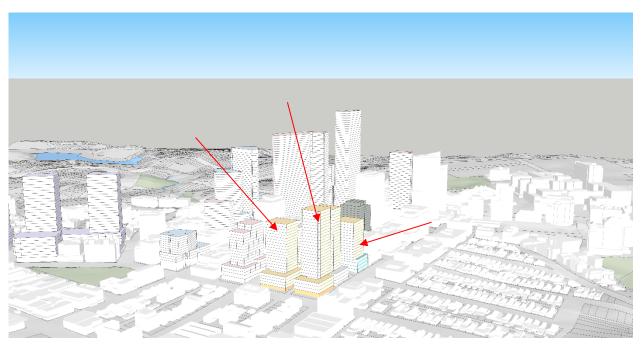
Extract of concept scheme showing the potential built-form outcome of the Planning Proposal application Source: Architectus 2018
